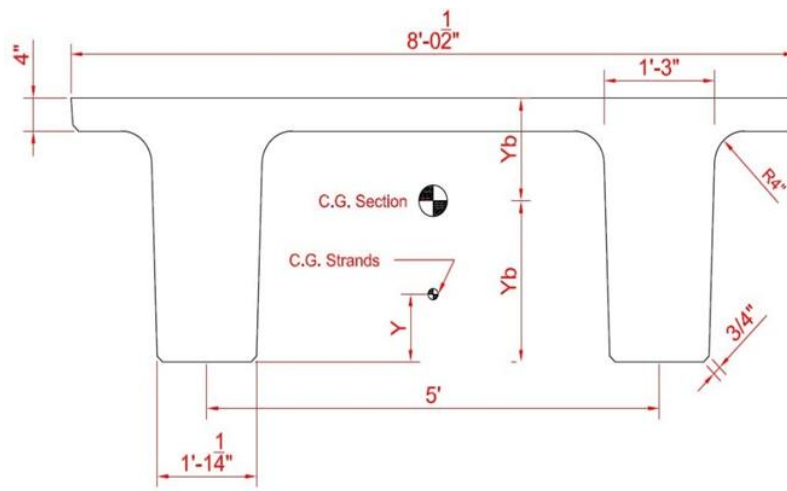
NEXT Beam Section Used in Brimfield Bridge
